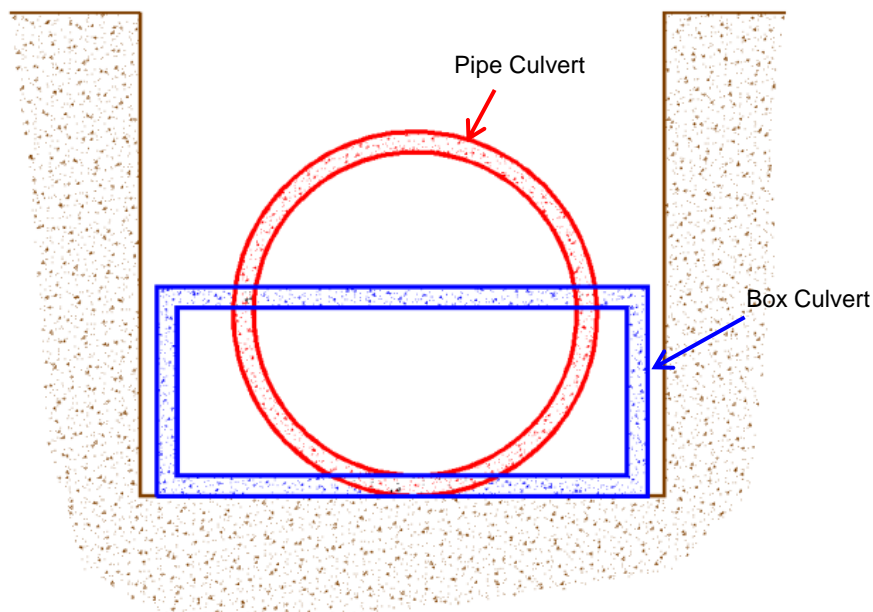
Hydraulic Head Effects in Box and Pipe Culverts
